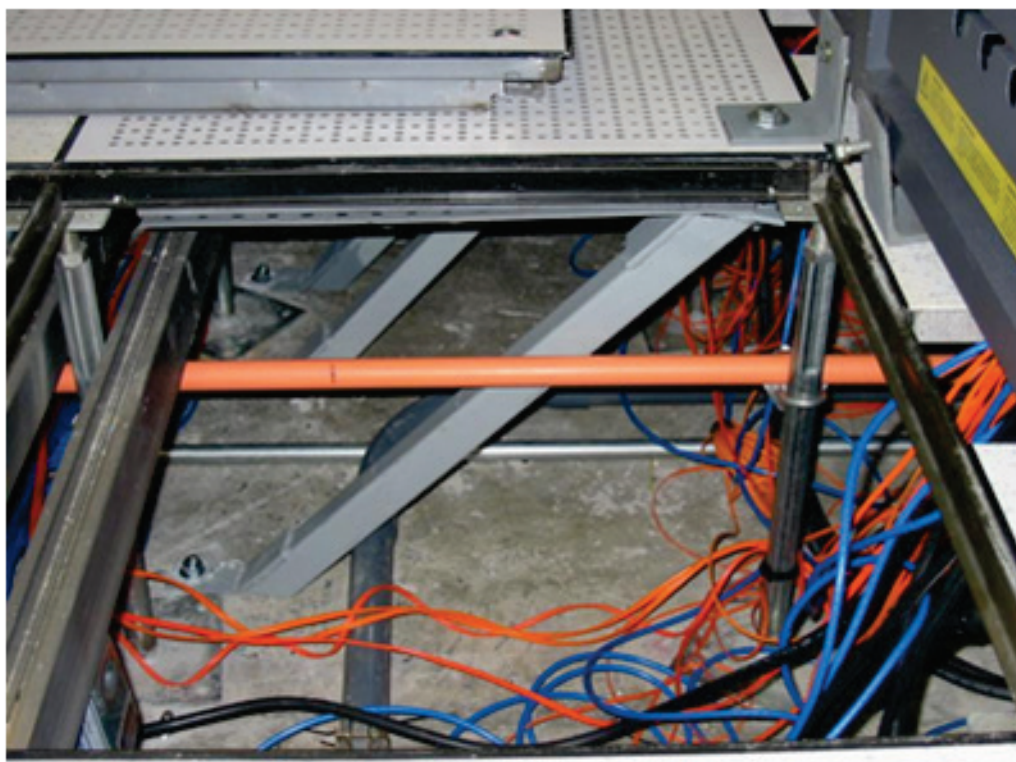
Raised floor braced with strut (Photo courtesy of Maryann Phipps, Estructure).
